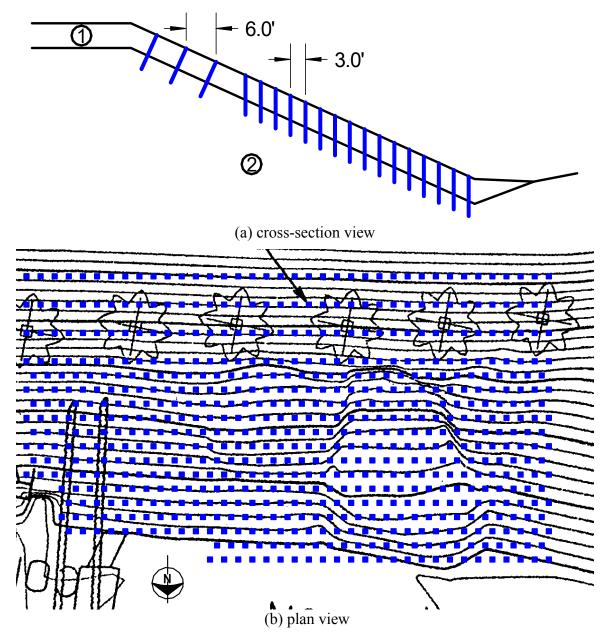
Selected stabilization scheme for the I435-Wornall Road site:
